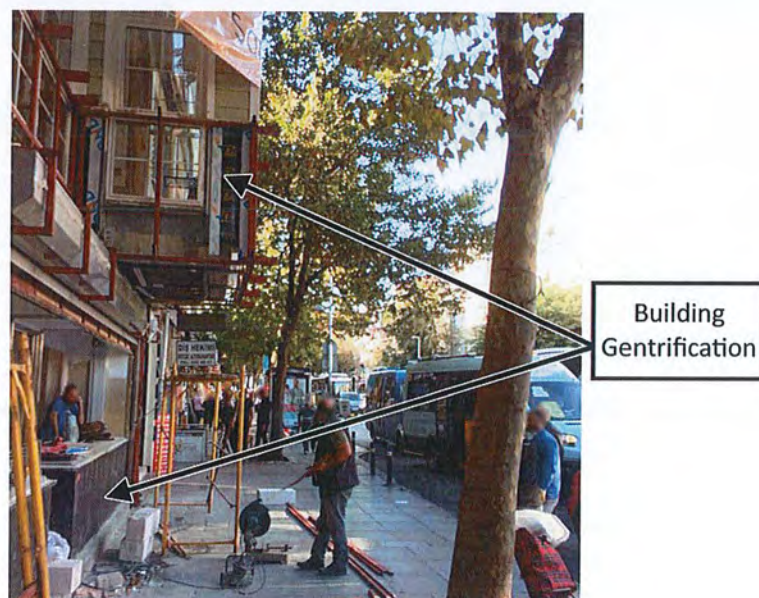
Building Rejuvenation in Site 10 (self-taken photograph)
